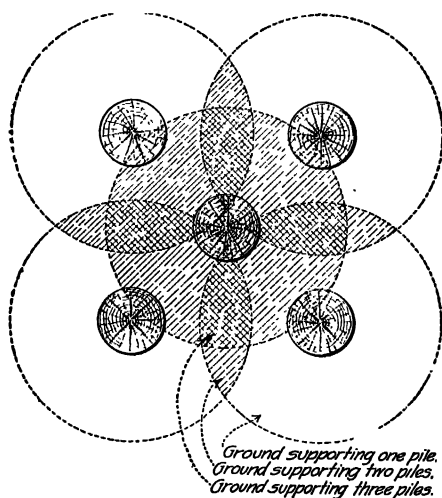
Group of piles closely spaced, showing overlapping of supporting areas. Note that center pile brings no additional capacity to pier.
